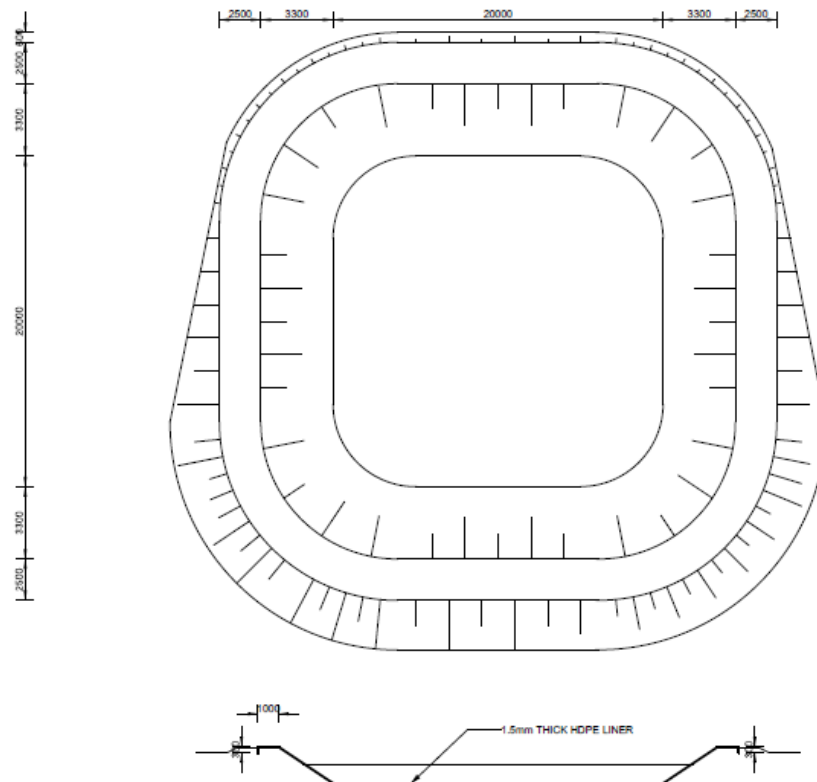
Preliminary design of designated shallow wash water pond proposed as part of the expansion component, as well as mitigation for improving existing wash water handling from the Egglund facility.
